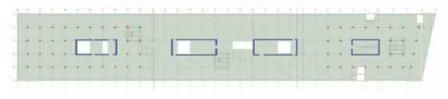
Typical floor plan, showing four new reinforced concrete shear wall cores (blue). Columns highlighted in red received FRP wrapping; typically the outer thirds of the building experienced greater interstory drift due to torsion.
